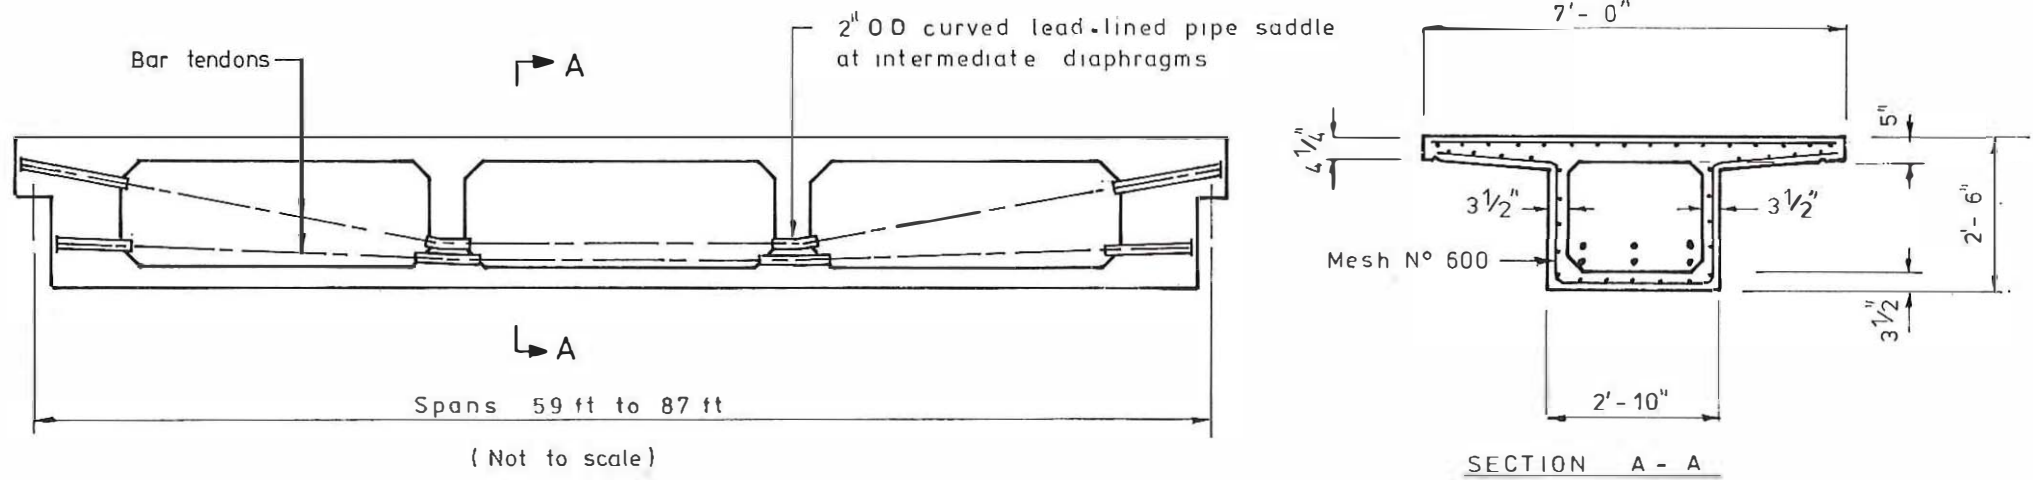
Pedestrian bridge over Frankston Freeway, Seaford. Cross section and longitudinal section of prestressed post-tensioned beam.
